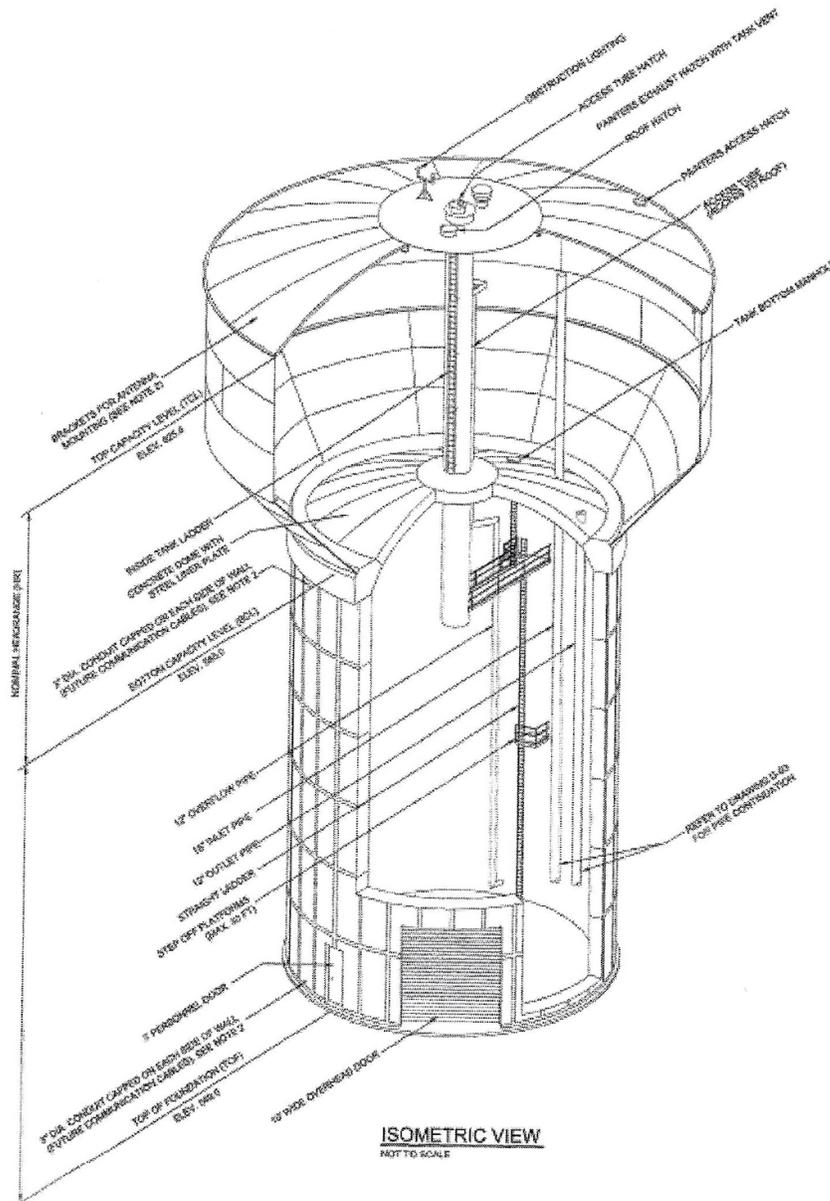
Proposed Elevated Storage Tank (provided by Engineer Drawings)
